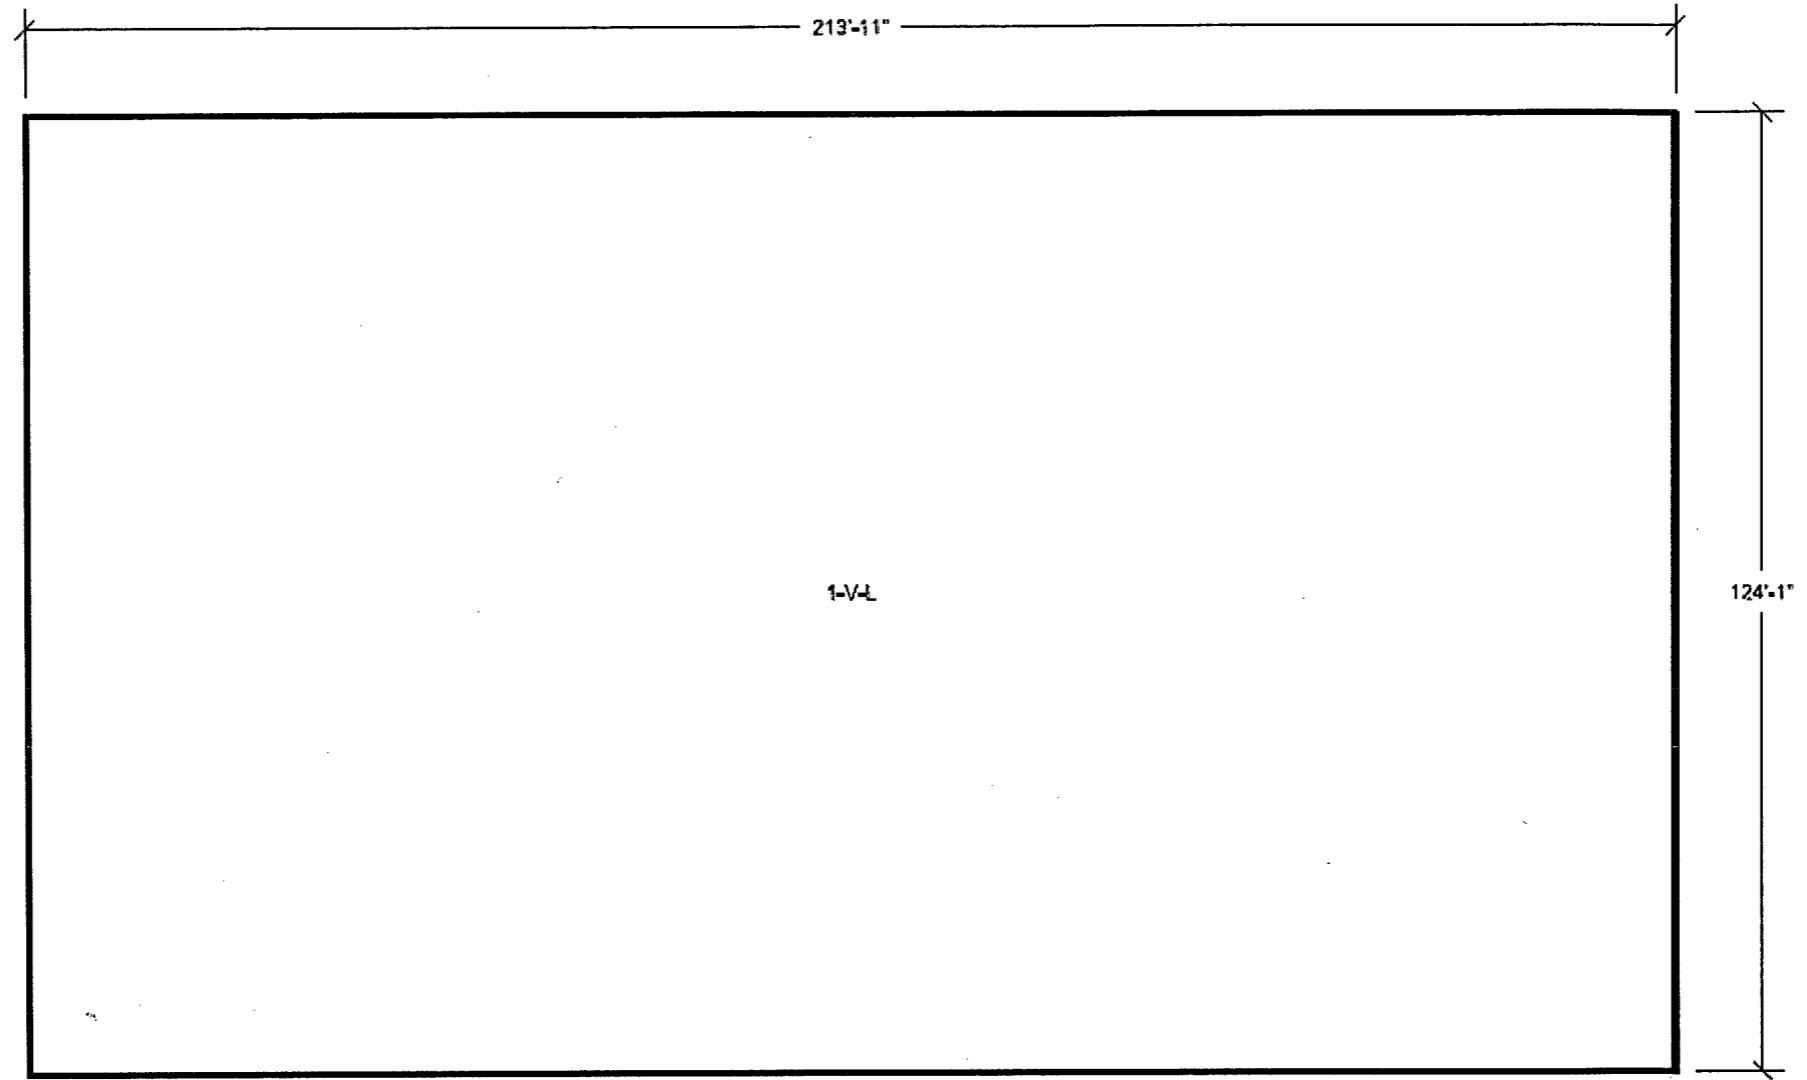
H.3-4.1: ELEVATION 95 LOOKING DOWN
